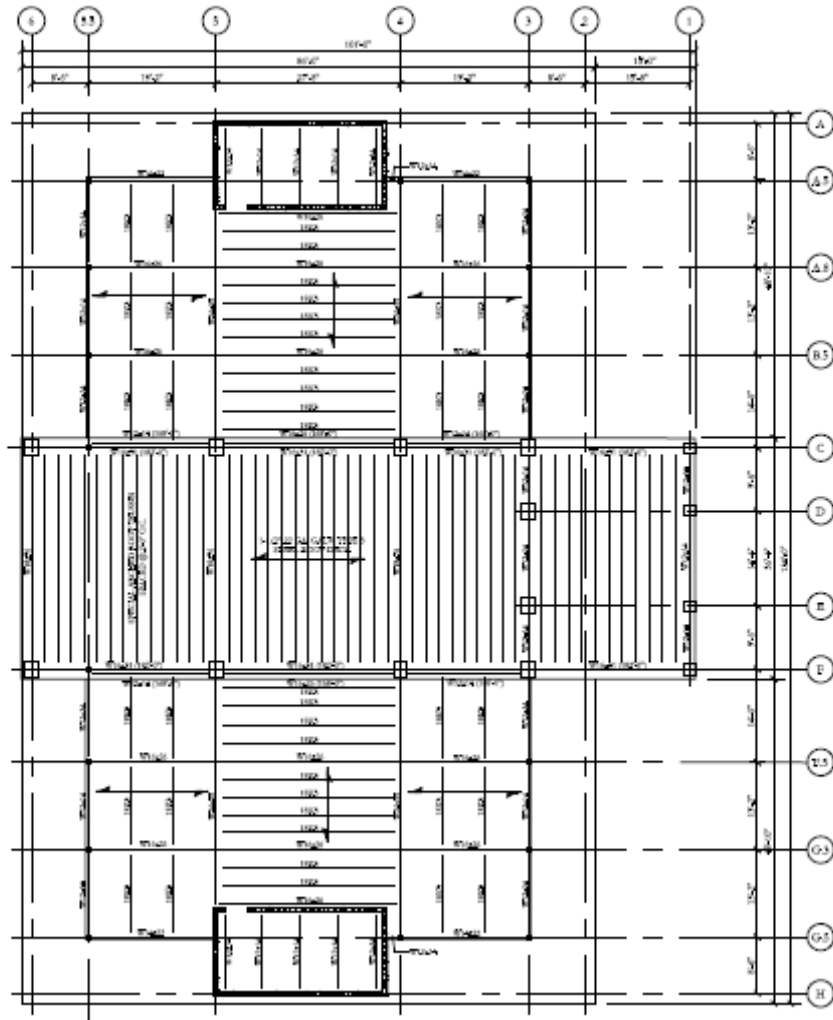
Proposed Concrete Structural System Roof Framing Plan
